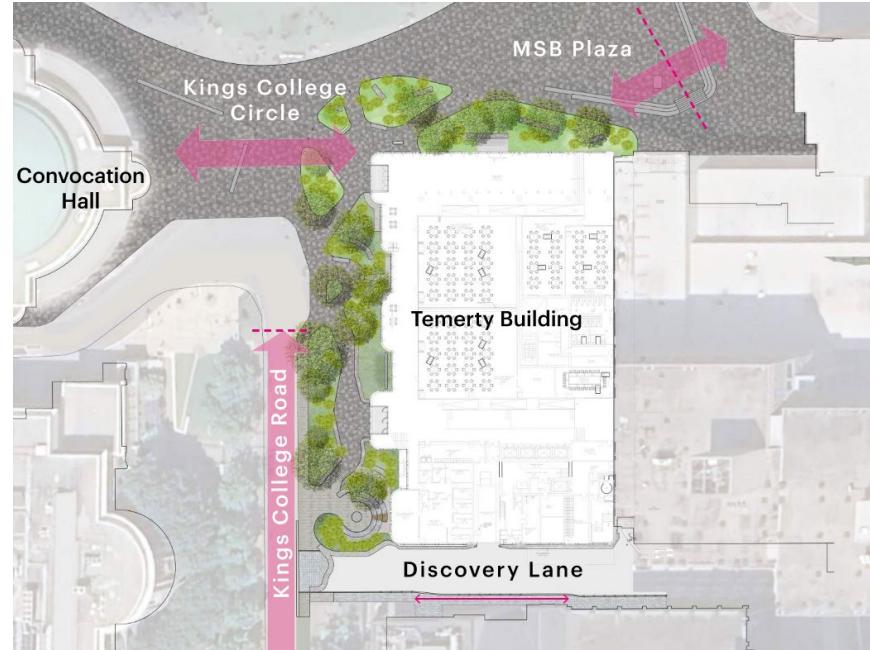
Context Plan (Source: Diamond Schmitt Architects Inc (DSAI)/MVRDV)
